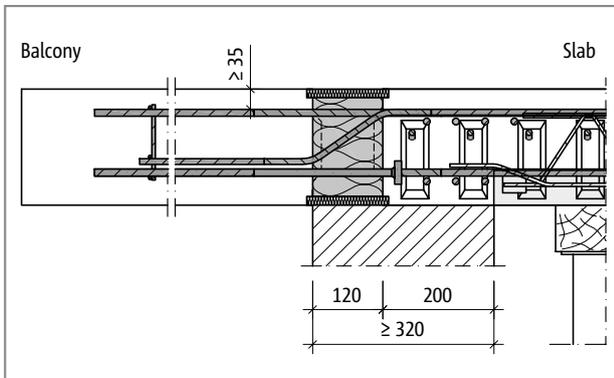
Schöck Isokorb® XT type C: Prefabricated slab with edge support with thermal insulating masonry (section XT type C-L-CV35, view XT type C-R-CV50)
